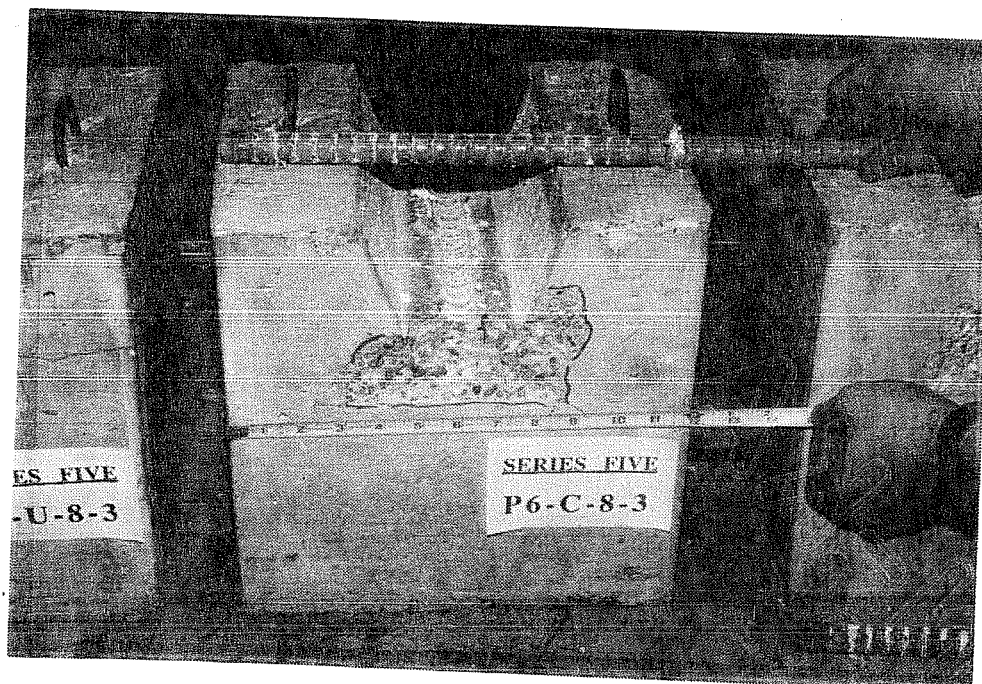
Epoxy-coated crescent deformation pattern #11 bar Type A pullout specimen after failure, top load = 10 kips, normal strength concrete.
